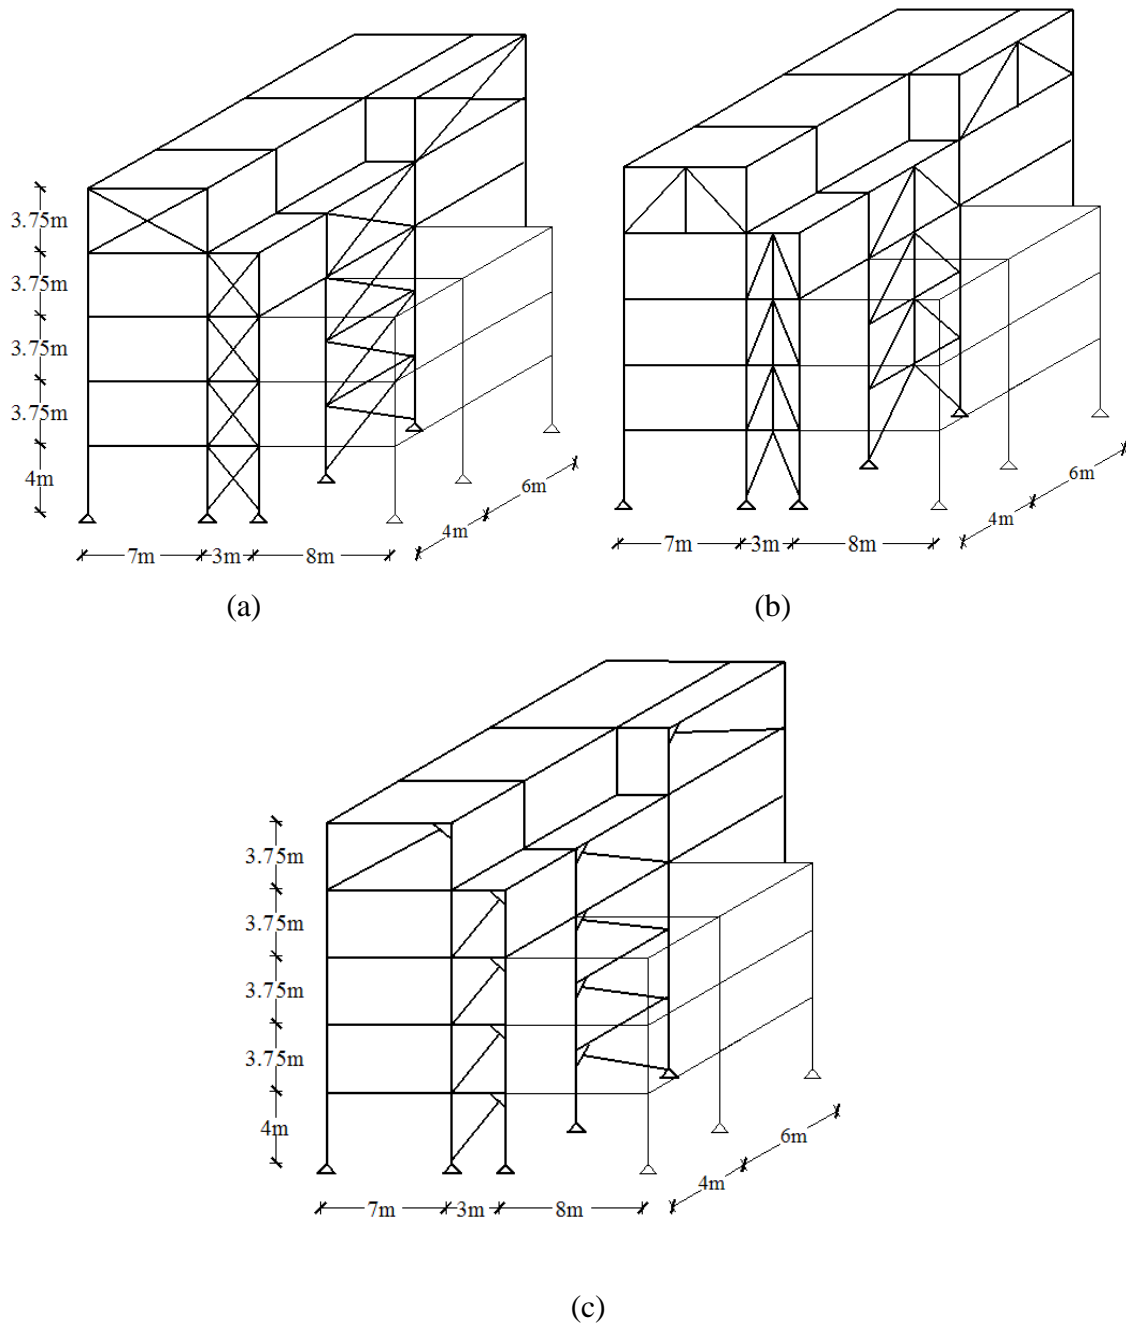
Asymmetrical Plan and Section central bays (a) cross (b) zipper (c) knee bracings
